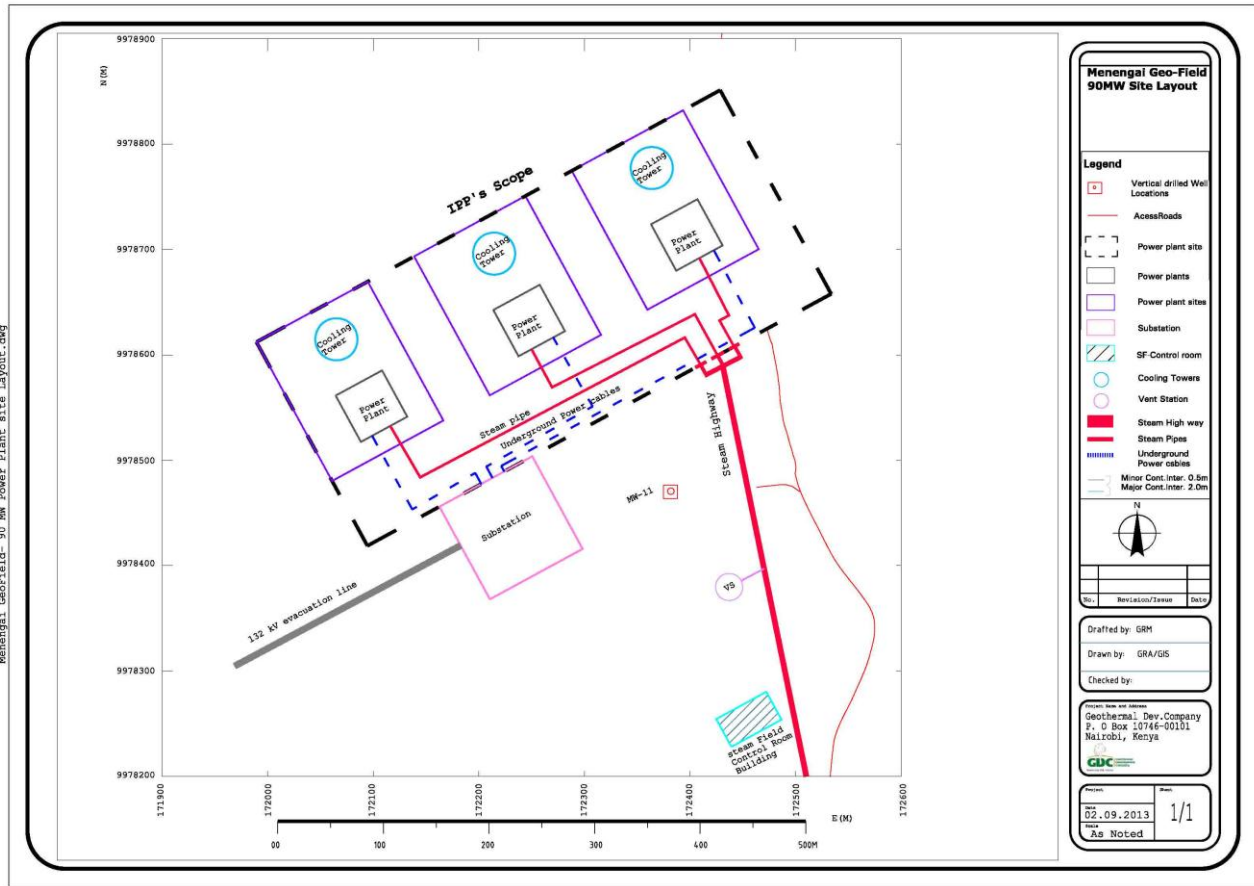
3 x30MW Modular Power Plants Site Layout Plan at Menengai Geothermal field
